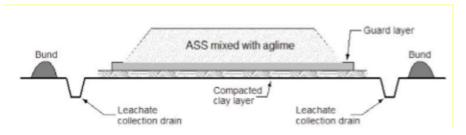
Schematic cross-section of a treatment pad, including clay layer, guard layer, leachate collection drain and bunding<sup>1</sup>
